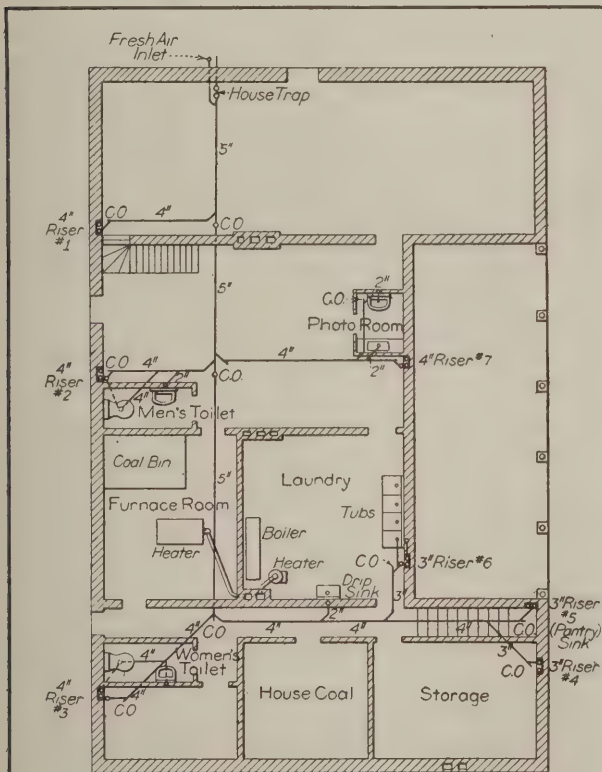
Plan of Basement of a Country House, Showing Arrangement of Fixtures and House Drains
